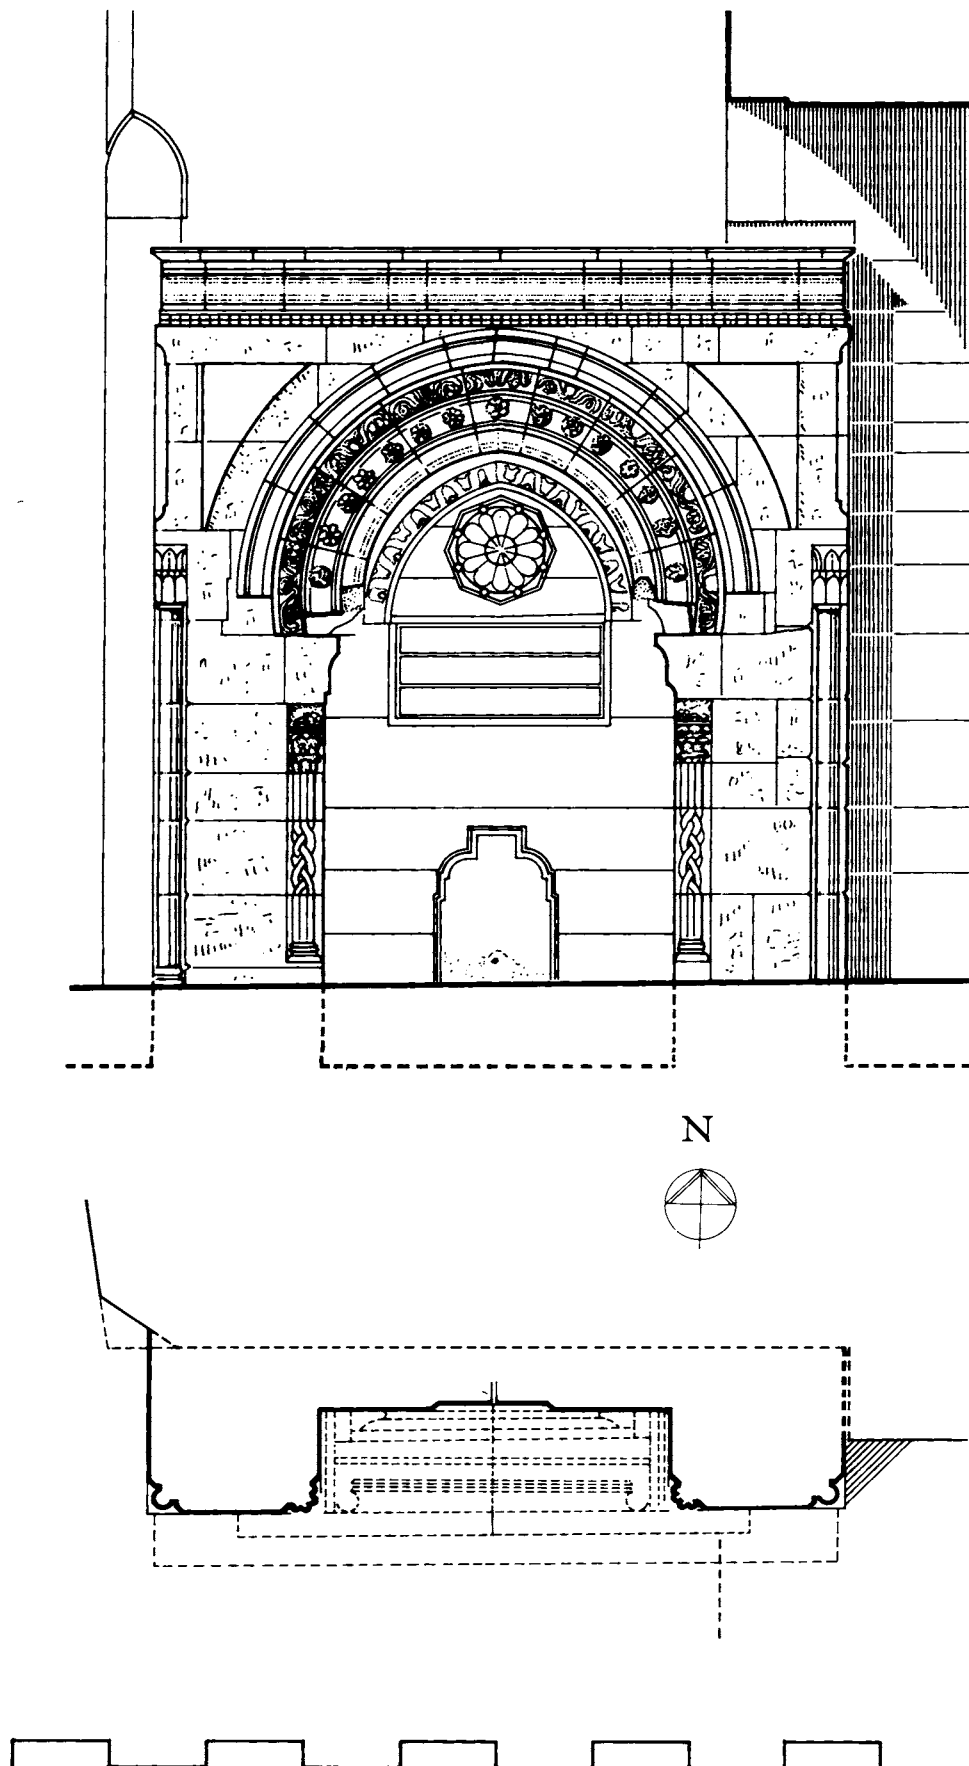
Sabil Bab al-Nazir, elevation and plan.
